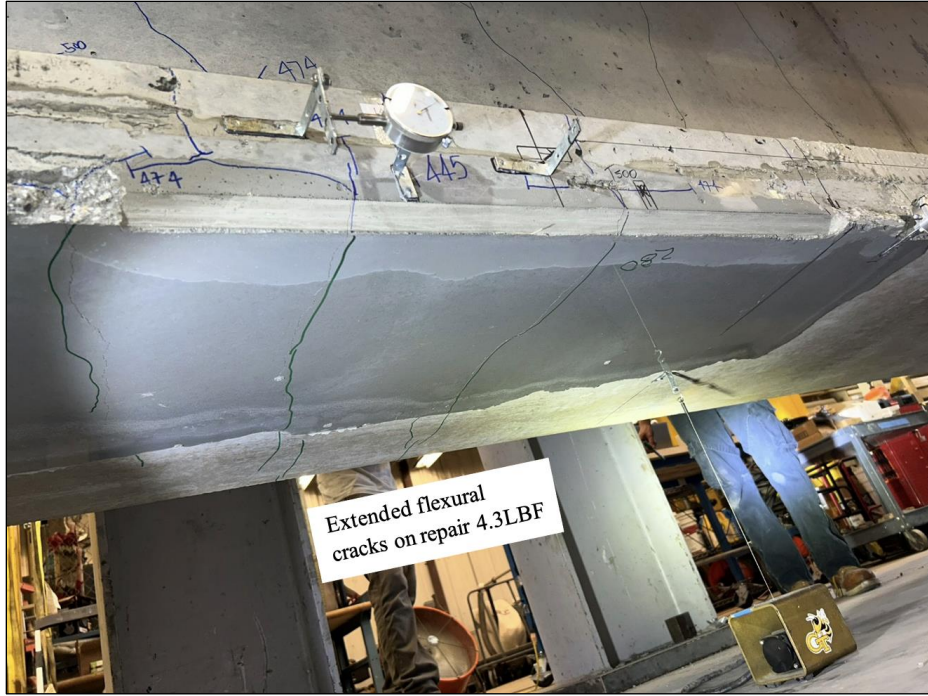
Photo. Test 4.3.F (repair 4.3LBF, 4.3LTF) repair 4.3LBF flexural cracks at 320 kip (left face of girder pictured).
